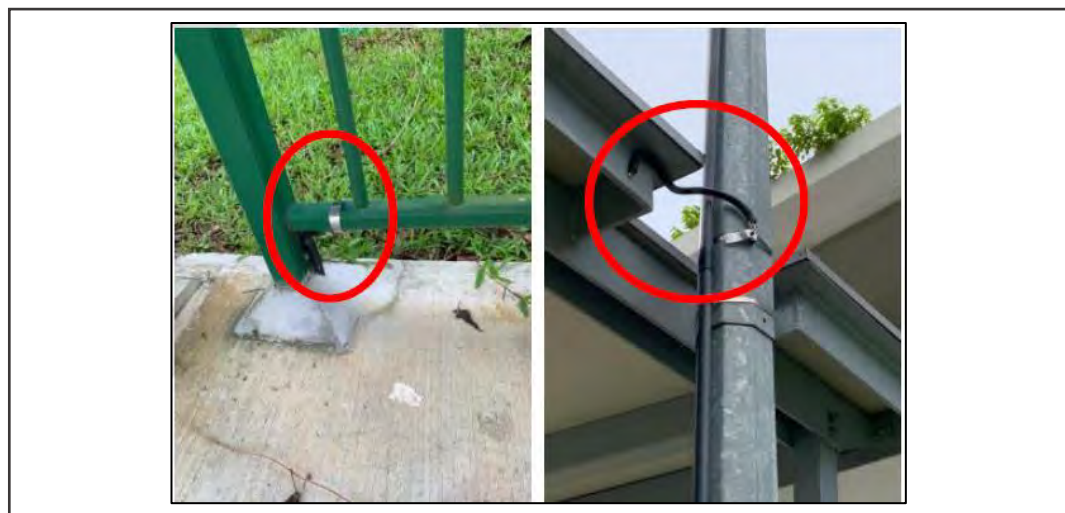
Equipotential Bonding at Handrail and Lamp Pole within the 2 Metre Radius
